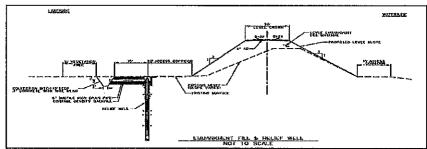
Fix in Place Levee Improvement with Relief Well.
